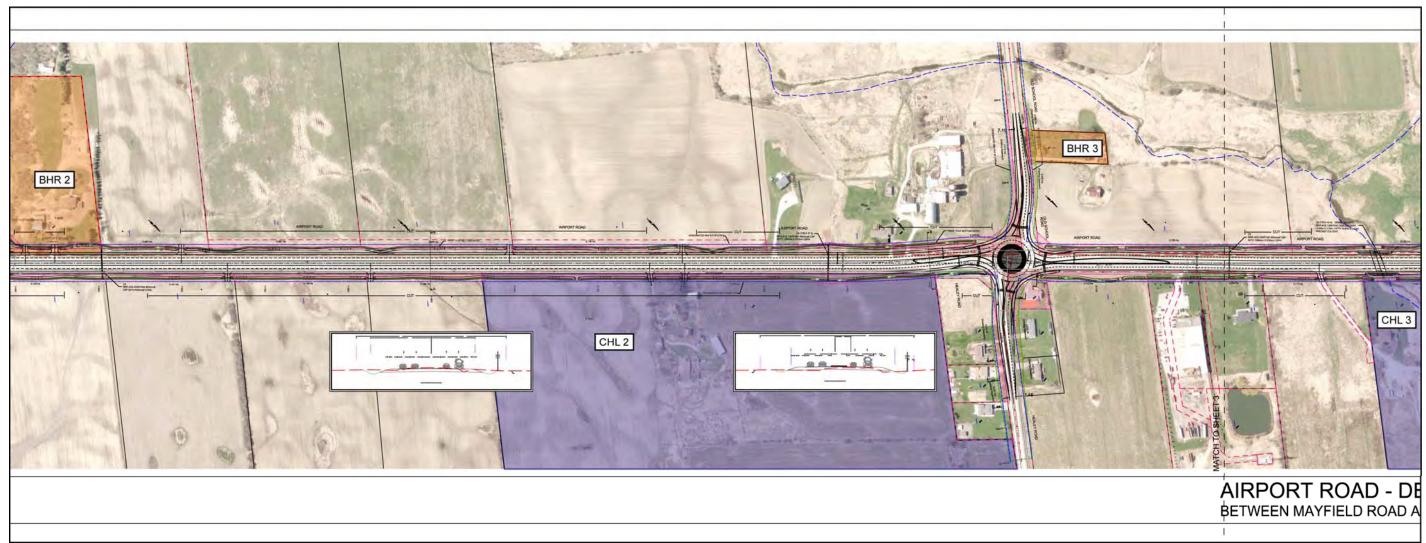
Proposed work for the Airport Road EA (Sheet 2)
